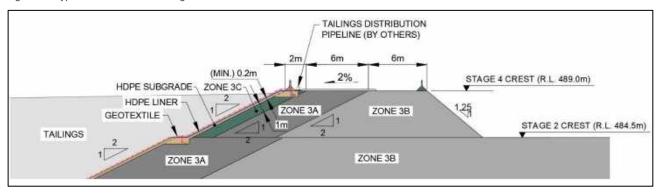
Typical Section IWLTSF Stage 4 South Embankment
